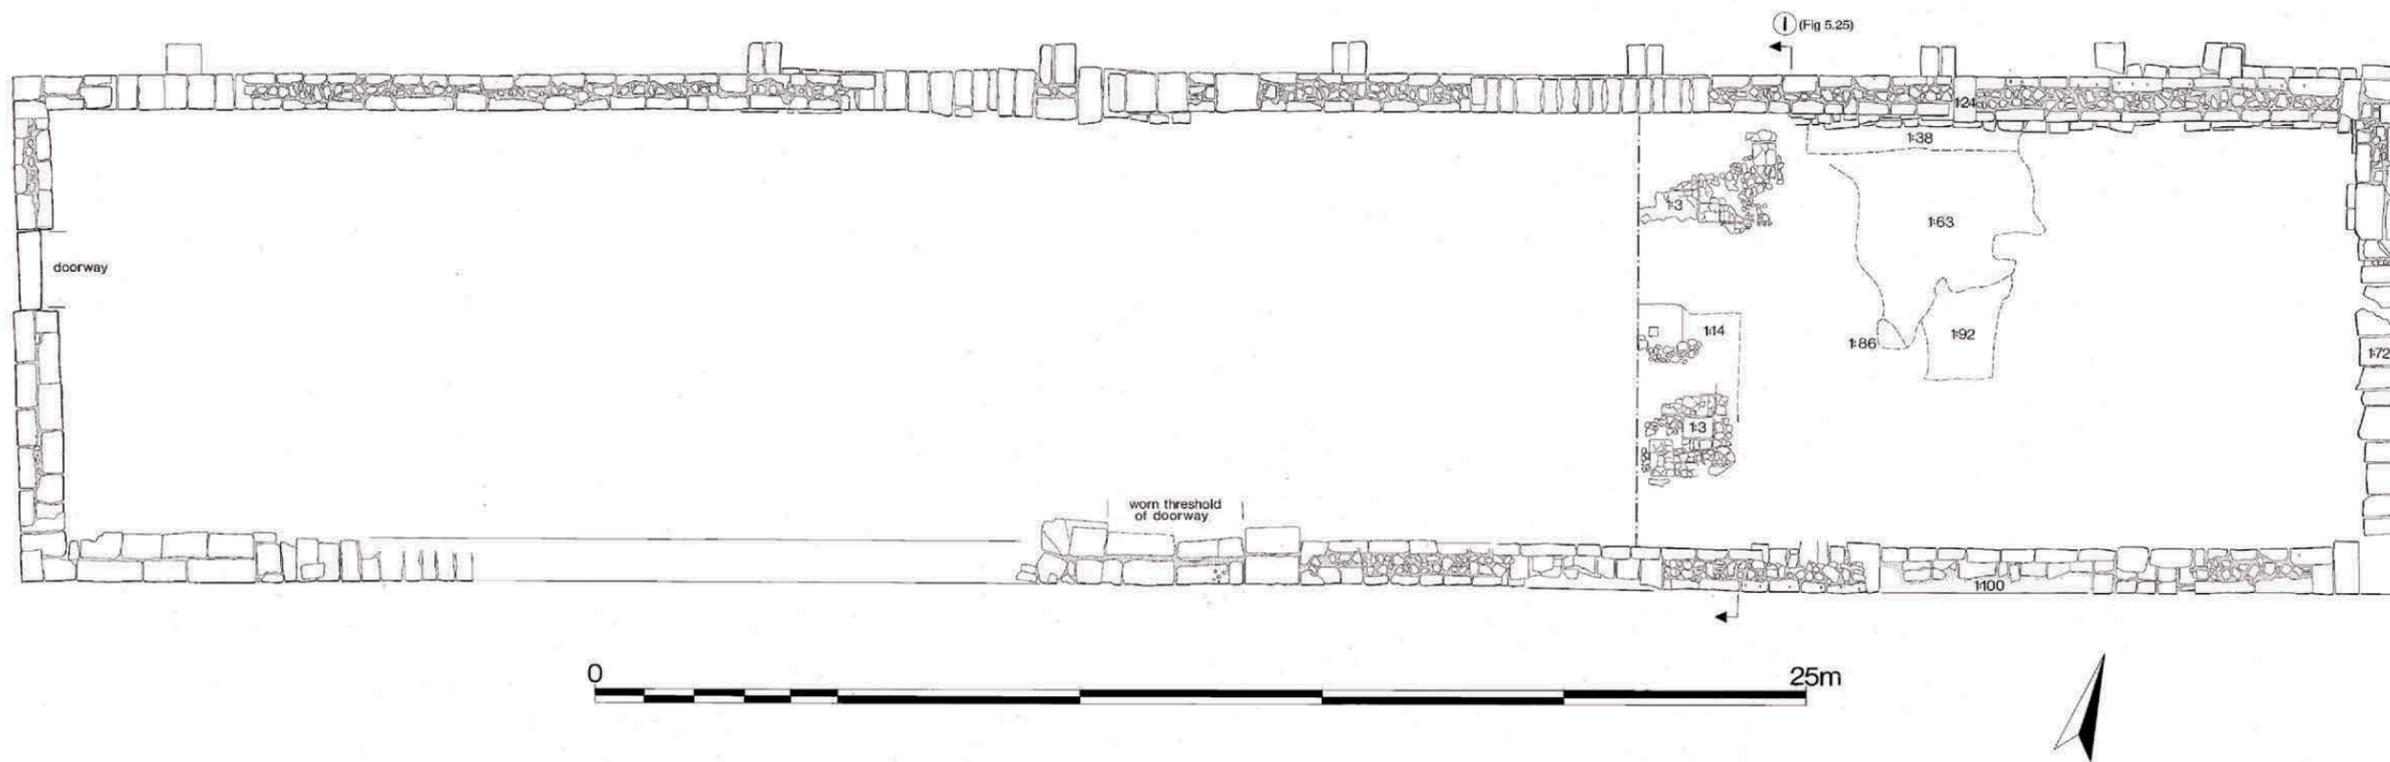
Building XV Phase 4: the storehouse (scale: 1:150).
